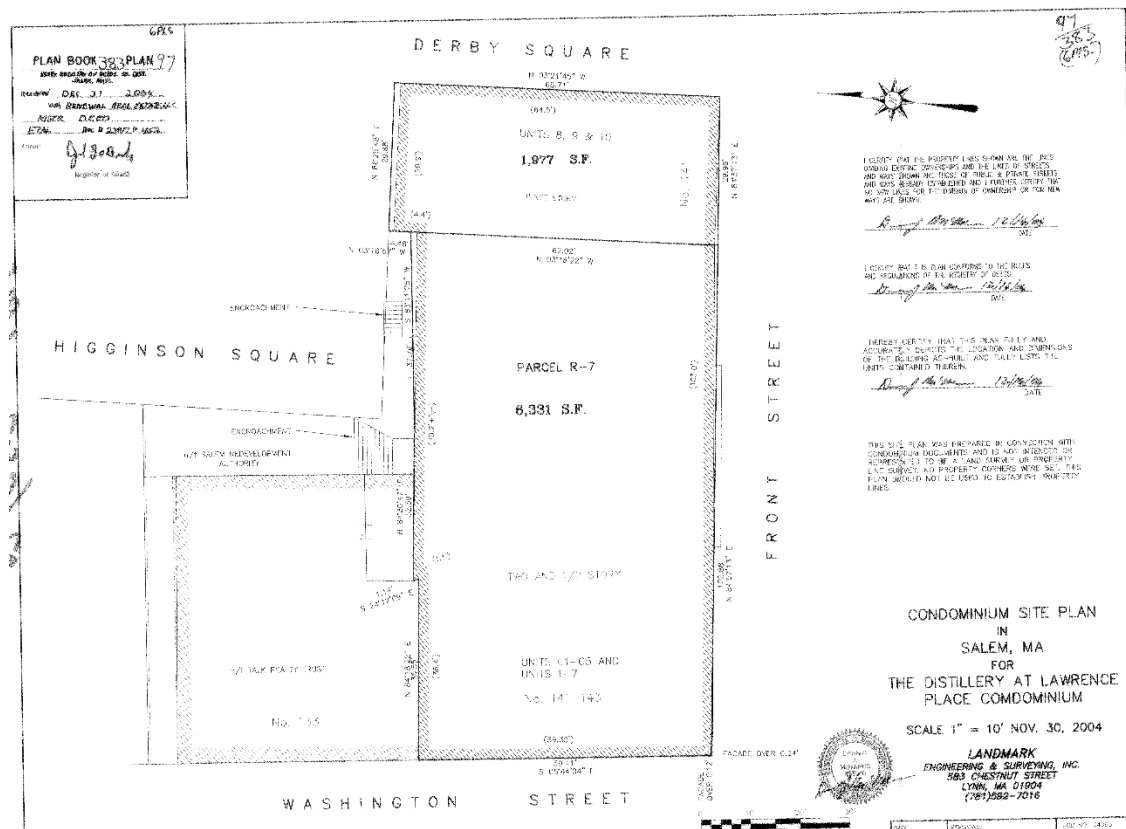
2004 Condominium Site Plan for The Distillery at Lawrence Place Condominium, SED Plan Book 383, Plan 97.
